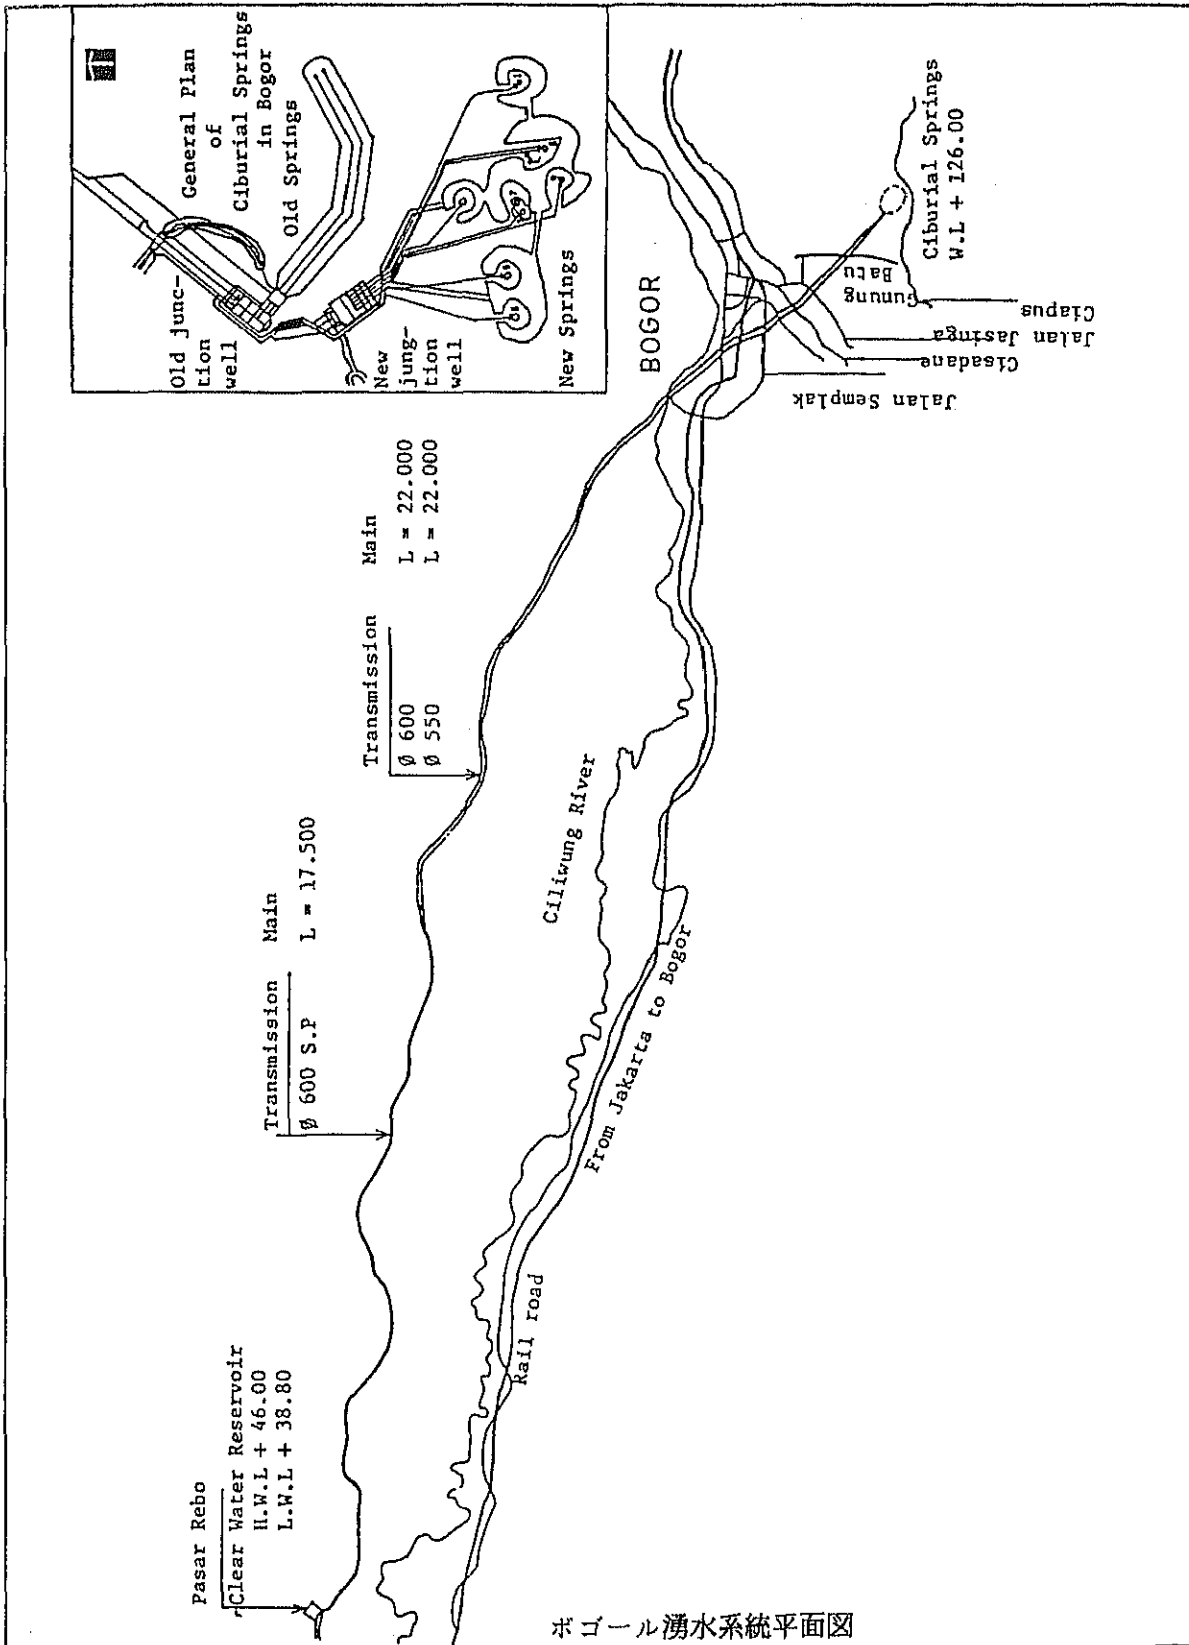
GENERAL PLAN OF EXISTING SYSTEM
